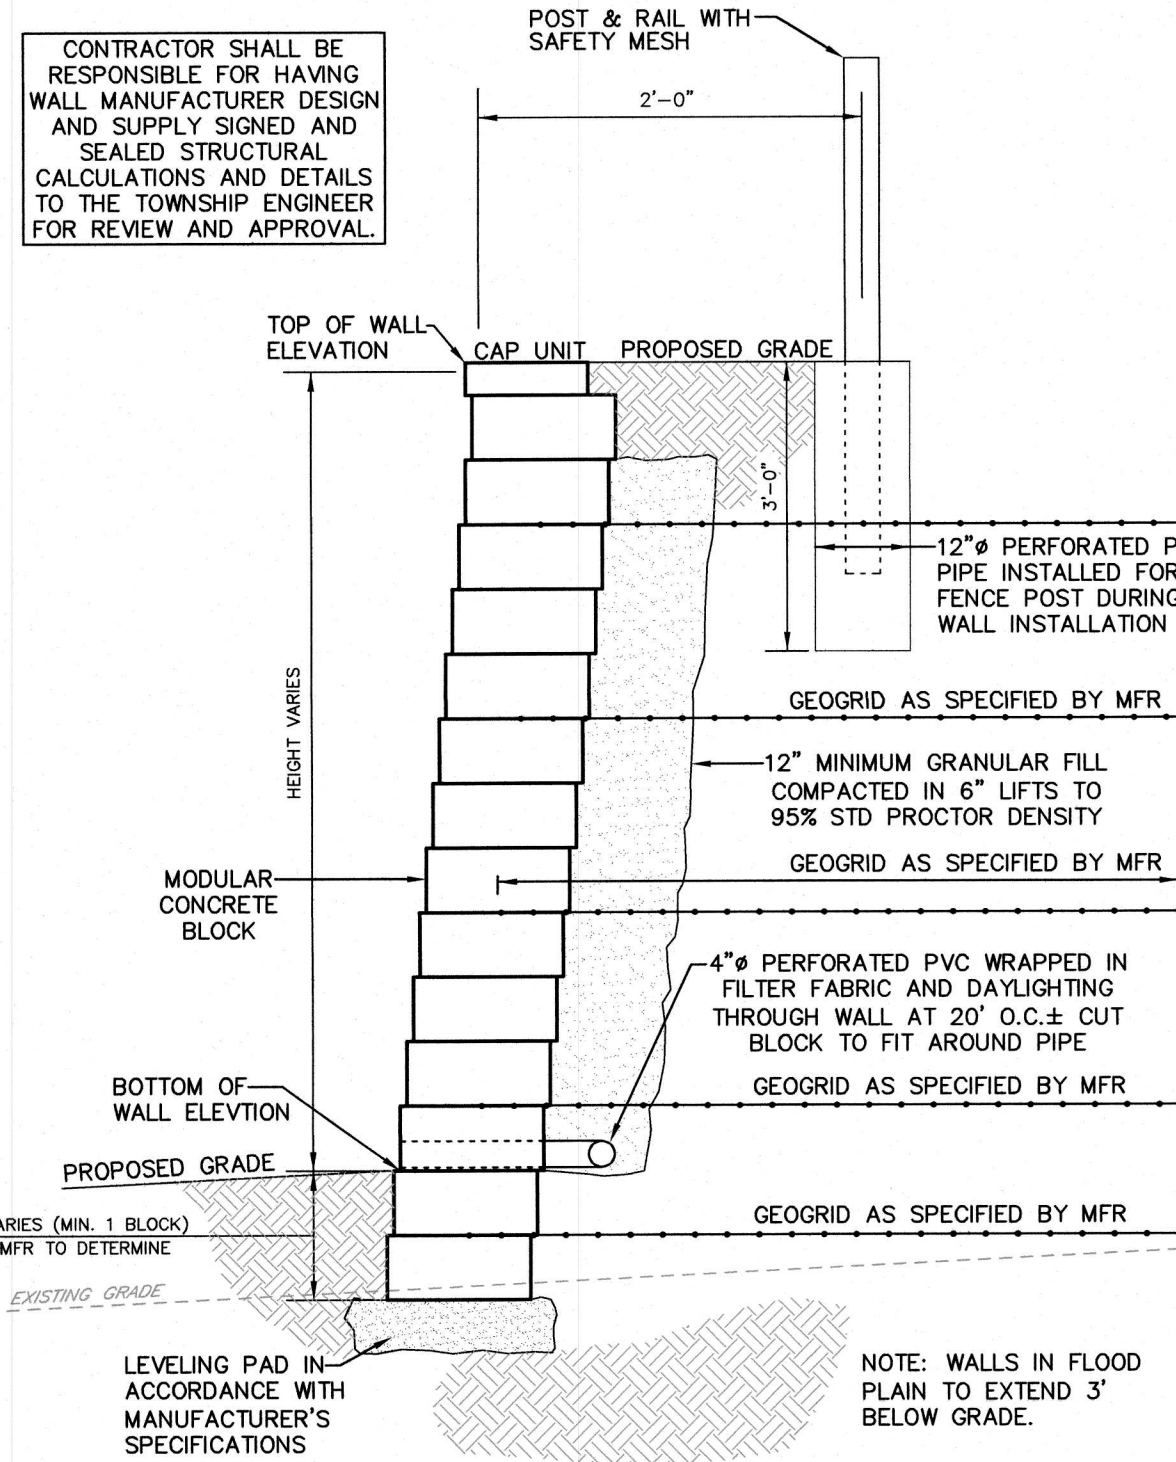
DETAIL OF FENCE POST INSTALLATION BEHIND RETAINING WALL USING SLEEVE-IT ASSEMBLY
